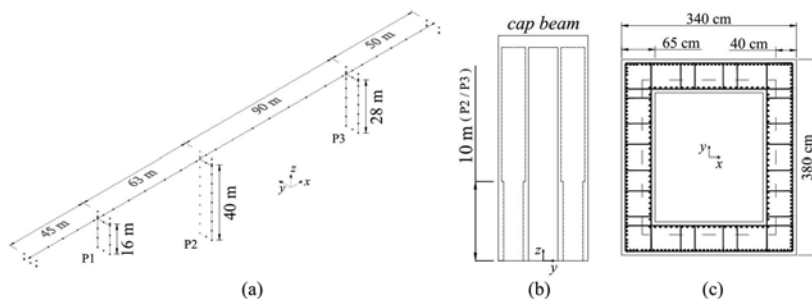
Highway bridge: (a) Structural model; (b) Transverse sectional view of a bridge pier; (c) single-bent cross-section at the base of pier P3.
